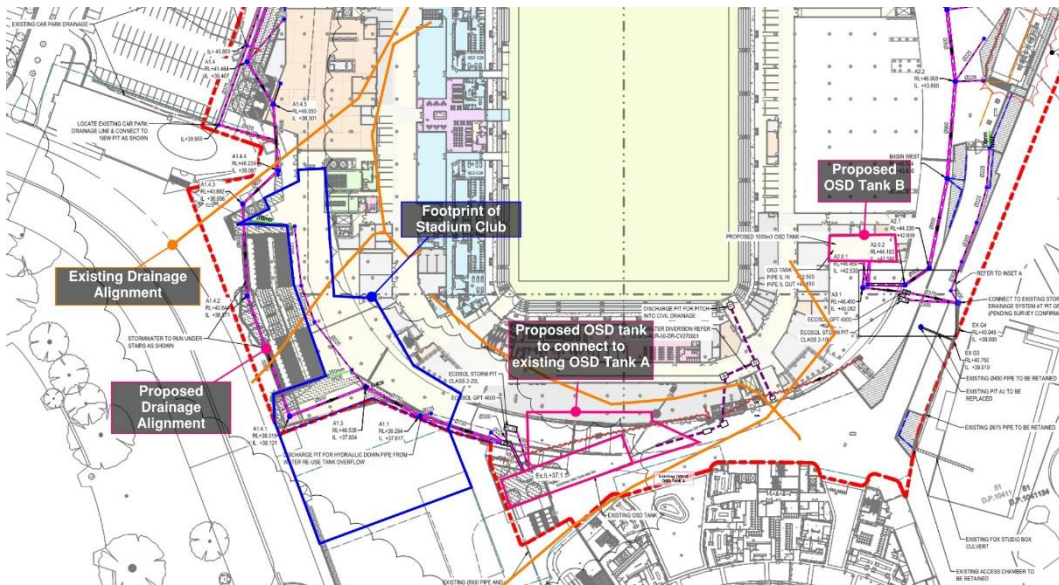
SFSR stormwater drainage plan (Aurecon, April 2020)
